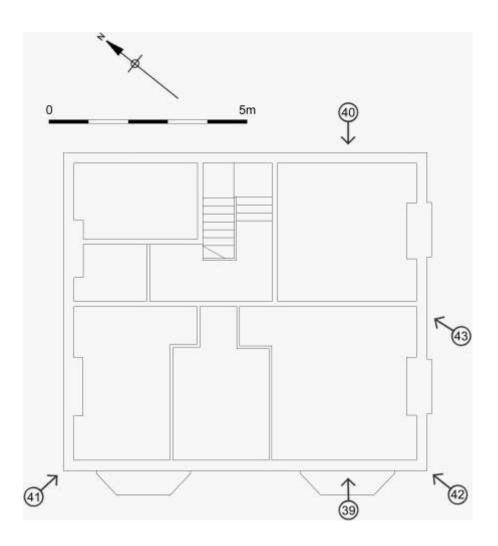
Plan of the first floor showing location and direction of detailed external views (Figs.39-43)
